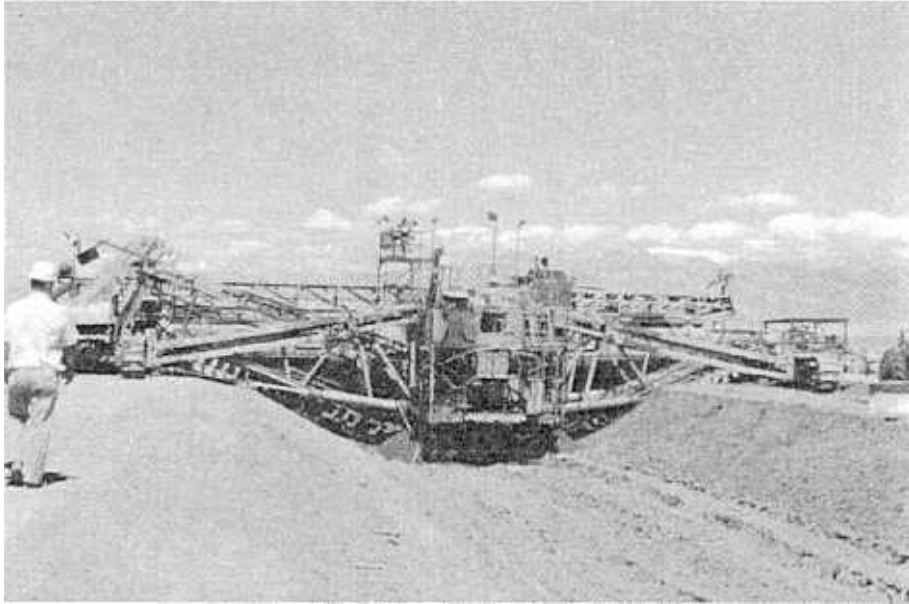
View of equipment for the mechanized placement of the PVC/protective soil cover. This lining machine is equipped with rotary blades which trim the canal prism. The excavated material is carried by conveyor belt, shown at left, to another machine shown on figure 26, which places it across the entire canal perimeter.
